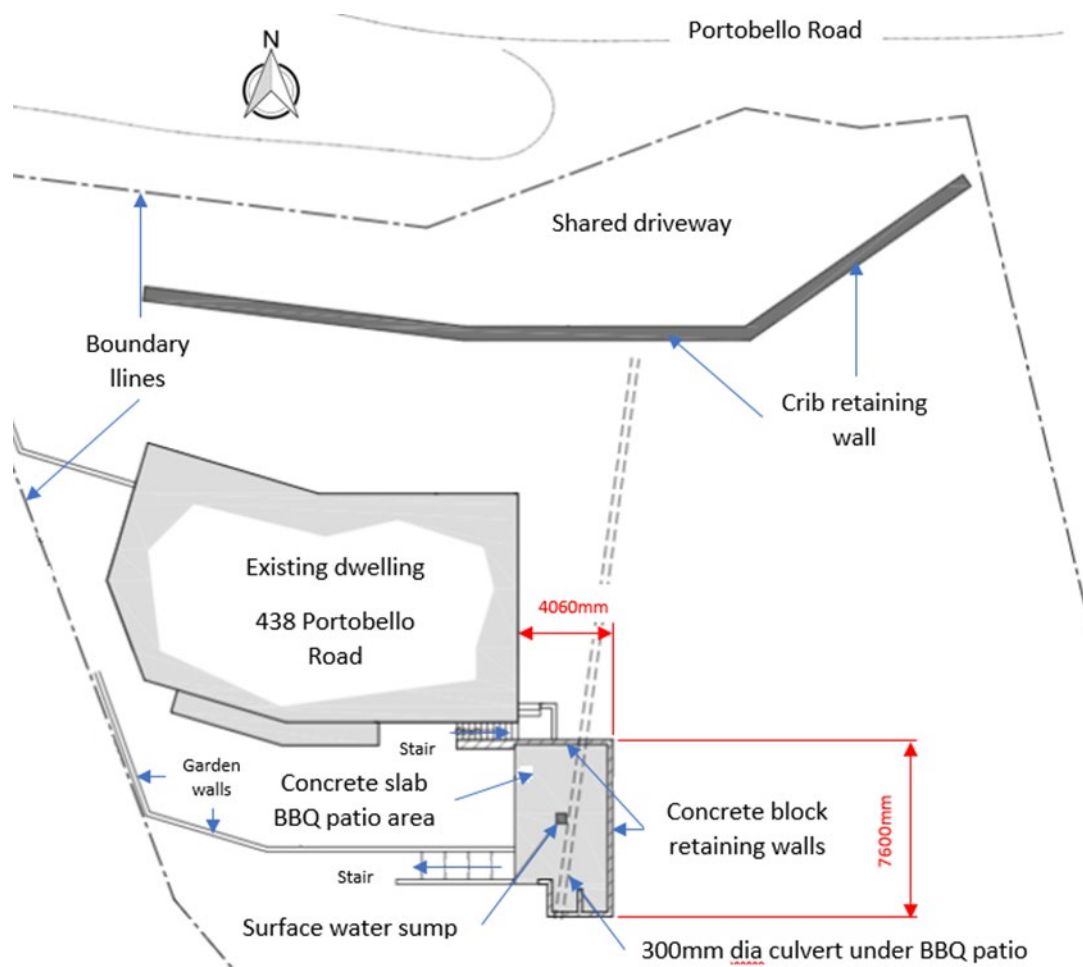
Site plan indicating location of barbecue area retaining walls (not to scale)
